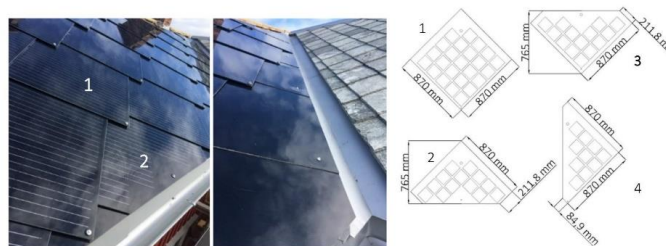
BIPV system 1 installed on an actual building roof (left). Metal plates completing the BIPV system 1 at edges (middle). Range of BIPV shingles (right): 1 – basic solar shingle; 2 – solar shingle bottom; 3 – solar shingle top; 4 – solar shingle left.
